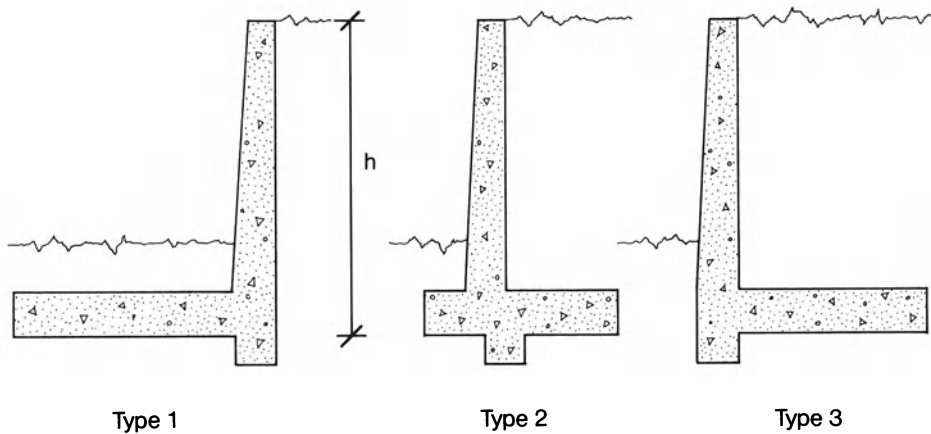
Different orientation of cantilever retaining walls, in which the width of the footing may be taken as $0.70h$ for Type 1, $0.50h$ for Type 2, and $0.60h$ for Type 3.
